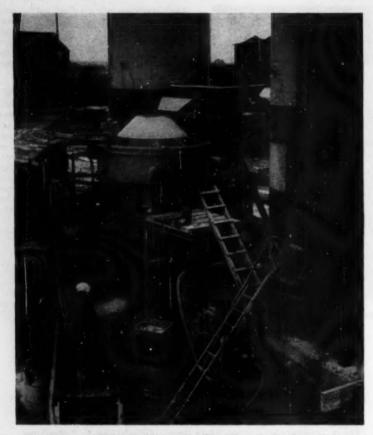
Concrete Mixing and Pumping Plant for the Southern Anchorages.
